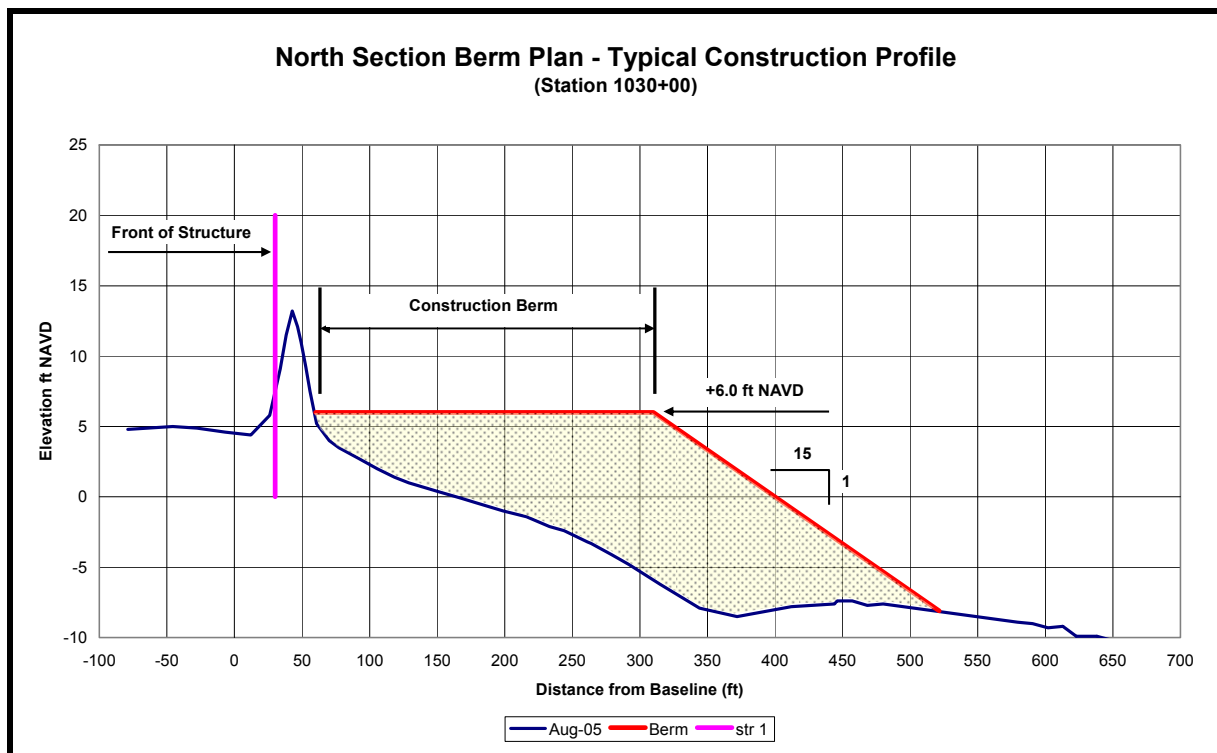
B. Typical construction profile, North Section Berm Plan (Station 1030+00).
